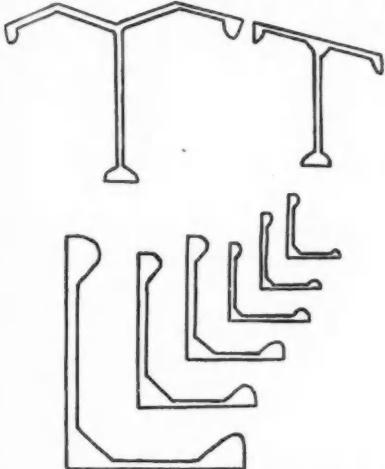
Typical aluminium-alloy structural sections. The two upper sections formed the chords of the ridge purlins and of the ordinary purlins respectively.
